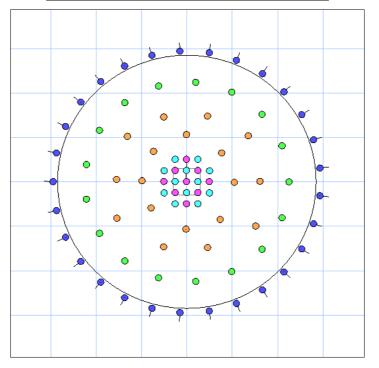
Drilling plan for the piercing plug (Implenia AS).
